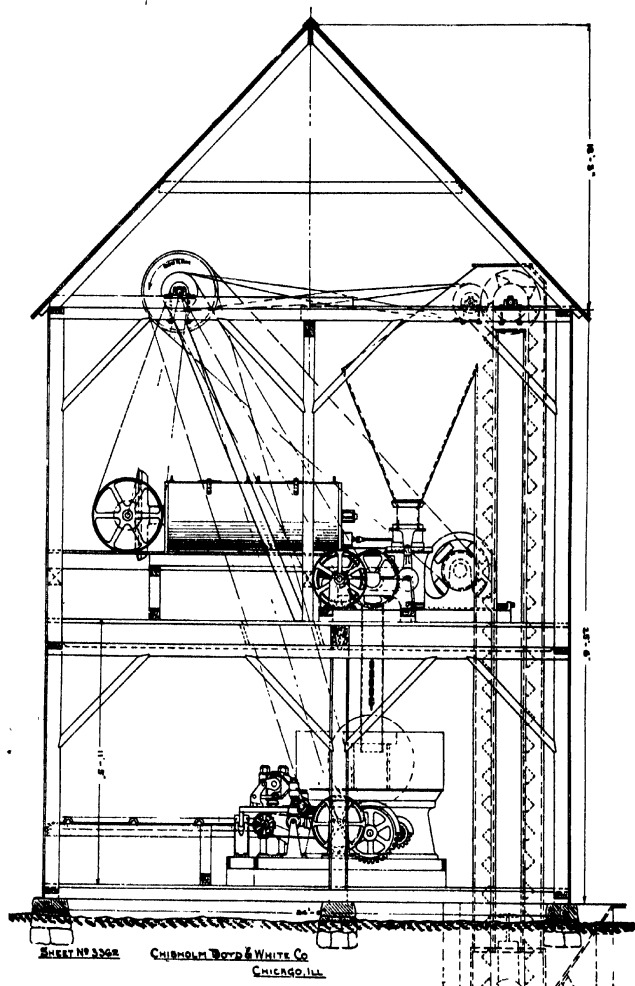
Elevation of Typical Chishom-Boyd-White Mineral Briquetting Plant. On 2nd Floor is Shown the Preparation Room; the Press on the Ground Floor..
